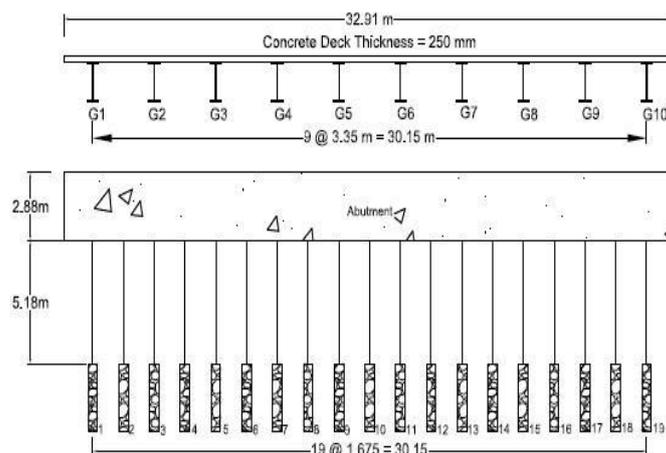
Cross sectional layout of the Scotch Road Bridge (Brendler and Khodair 2016)
